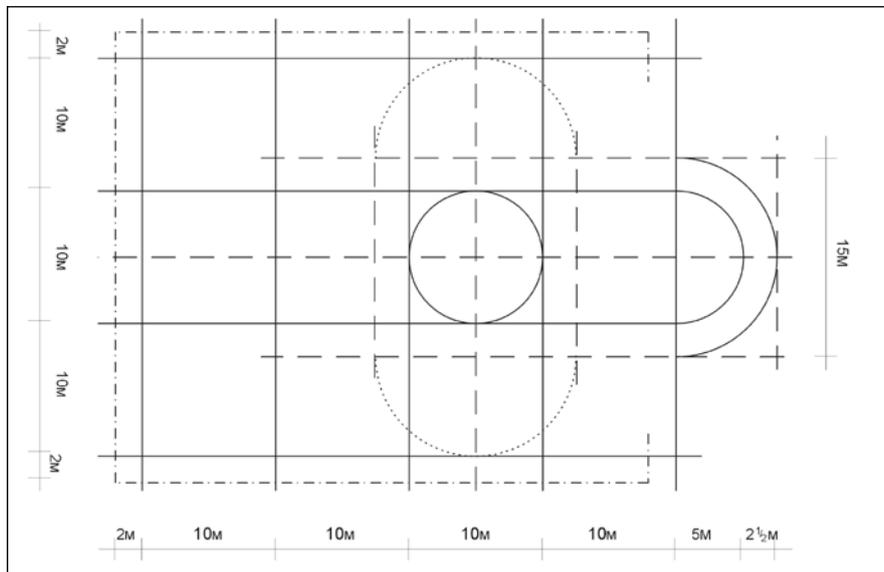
Supposed measuring scheme used for laying out the church plan (drawing: author)
